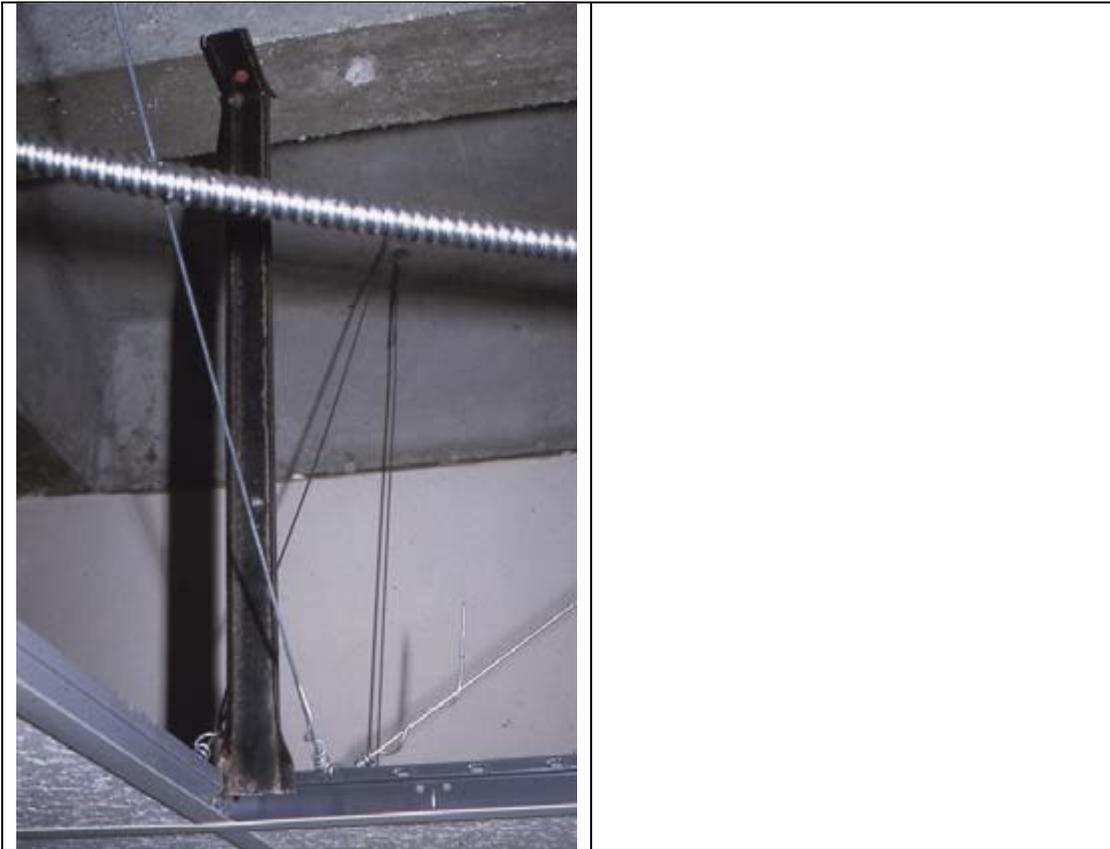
Common prescriptive approach to bracing a typical lightweight suspended ceiling, with four-way bracing wires and a vertical compression strut, [14].
